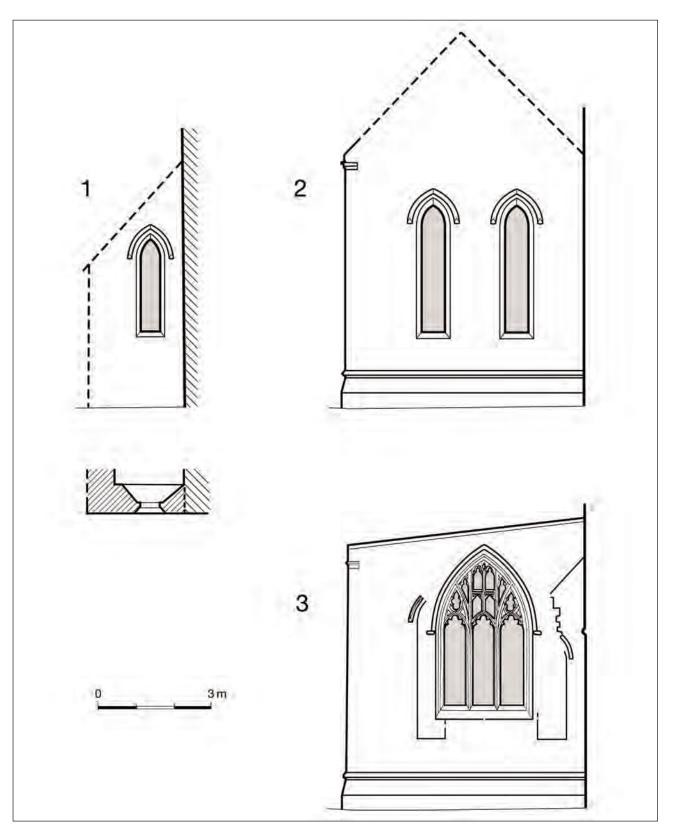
St Mary's: north aisle, west wall. 1 Reconstructed elevation and plan of the narrow aisle with a single, short lancet window; 2 Reconstruction of the wide aisle with a pair of taller lancets; 3 The present west window and relict evidence for the earlier fenestration. Scale 1:100. After Bryant 2003
